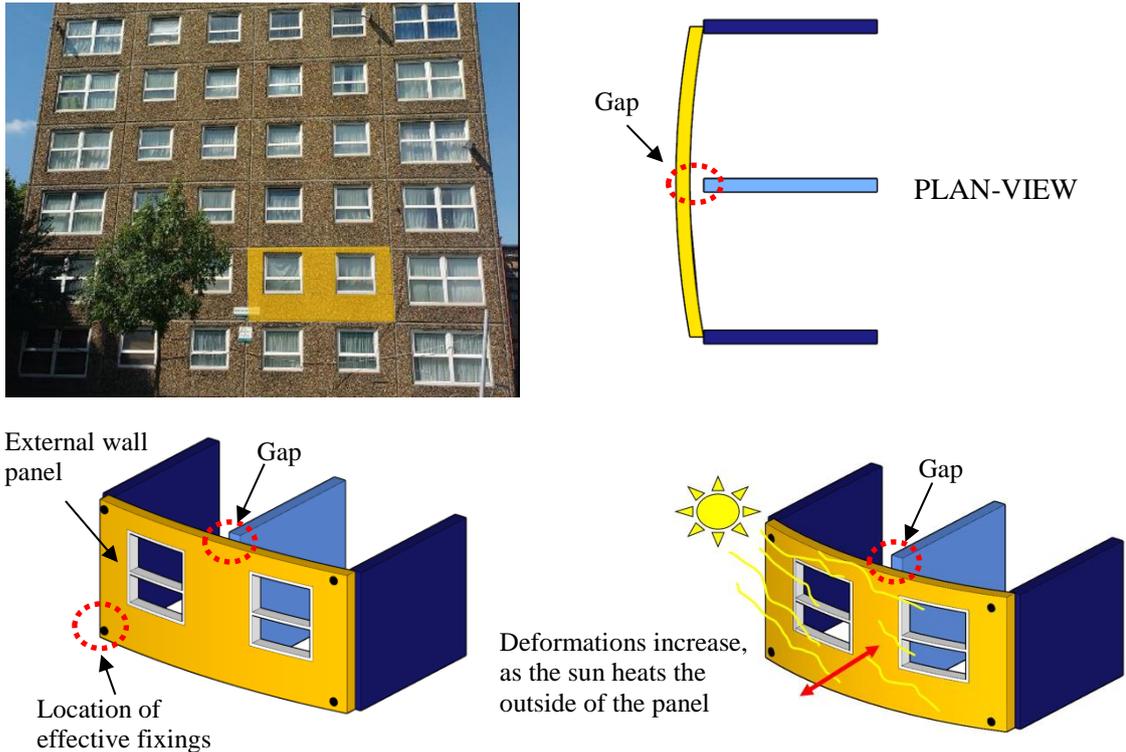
Floor to ceiling vertical gap between the intermediate cross-walls and the external wall panels
